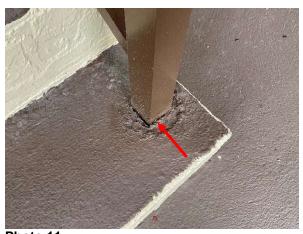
Building Cadiz - 1st Floor - Overall view of railing post base not sealed to the concrete.
